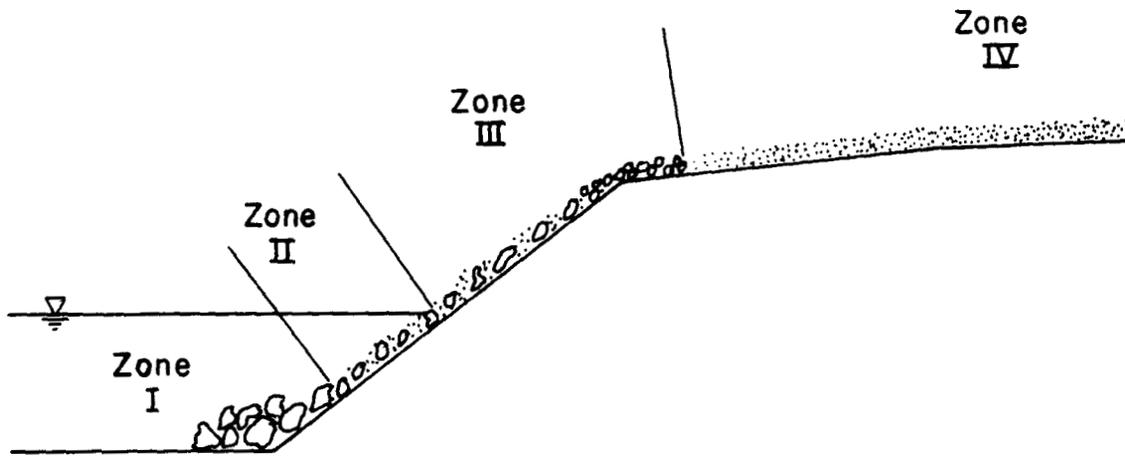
Zones of a reclaimed impoundment requiring riprap protection.
